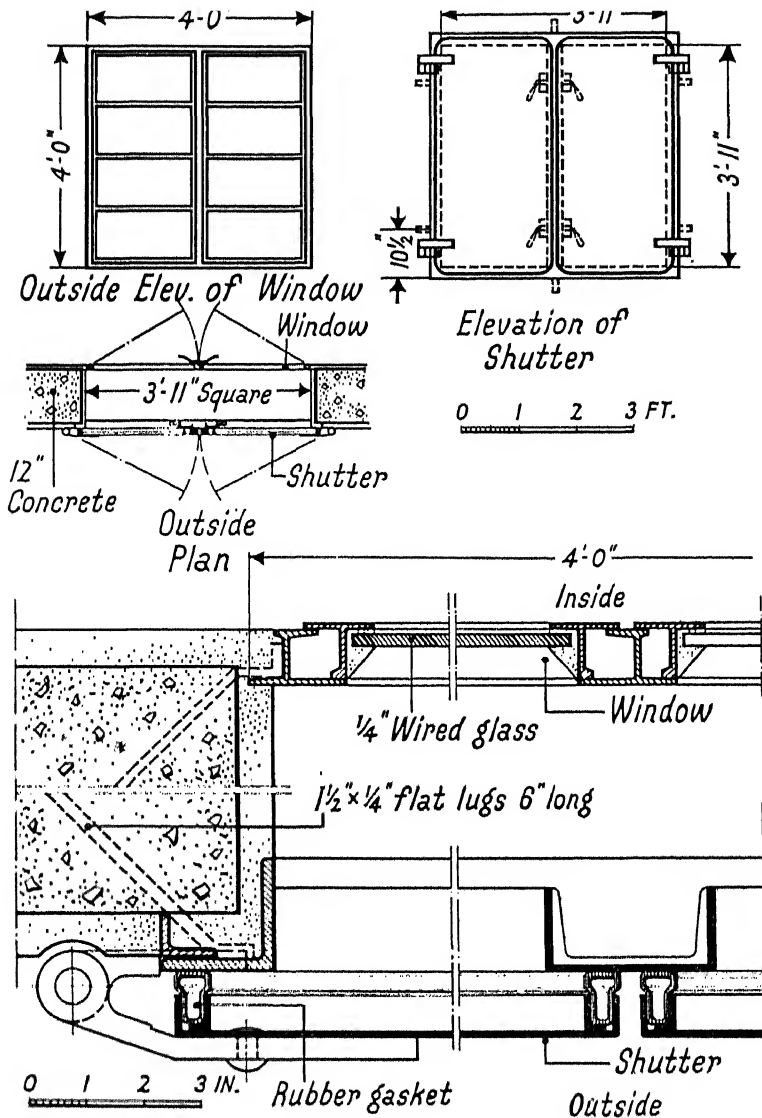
Crittall's blast-resisting and gas-proof folding window shutters hung on outside of opening with inward opening steel casements.
